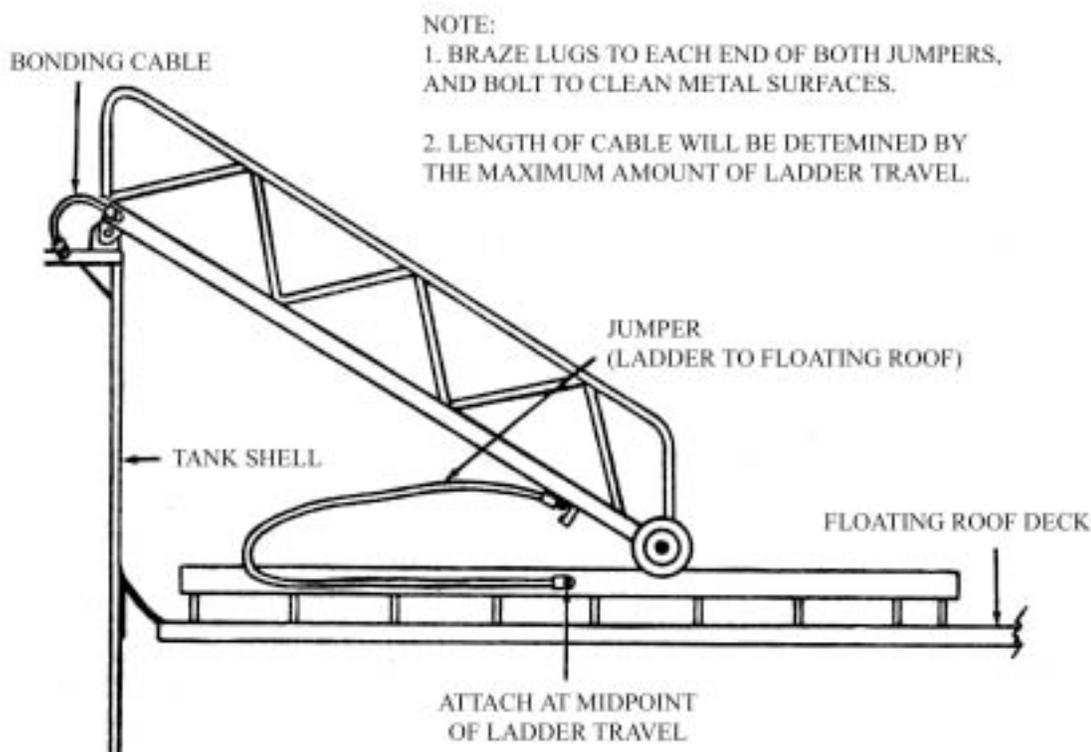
Typical Method of Bonding Ladders on Floating Roof Tanks.
